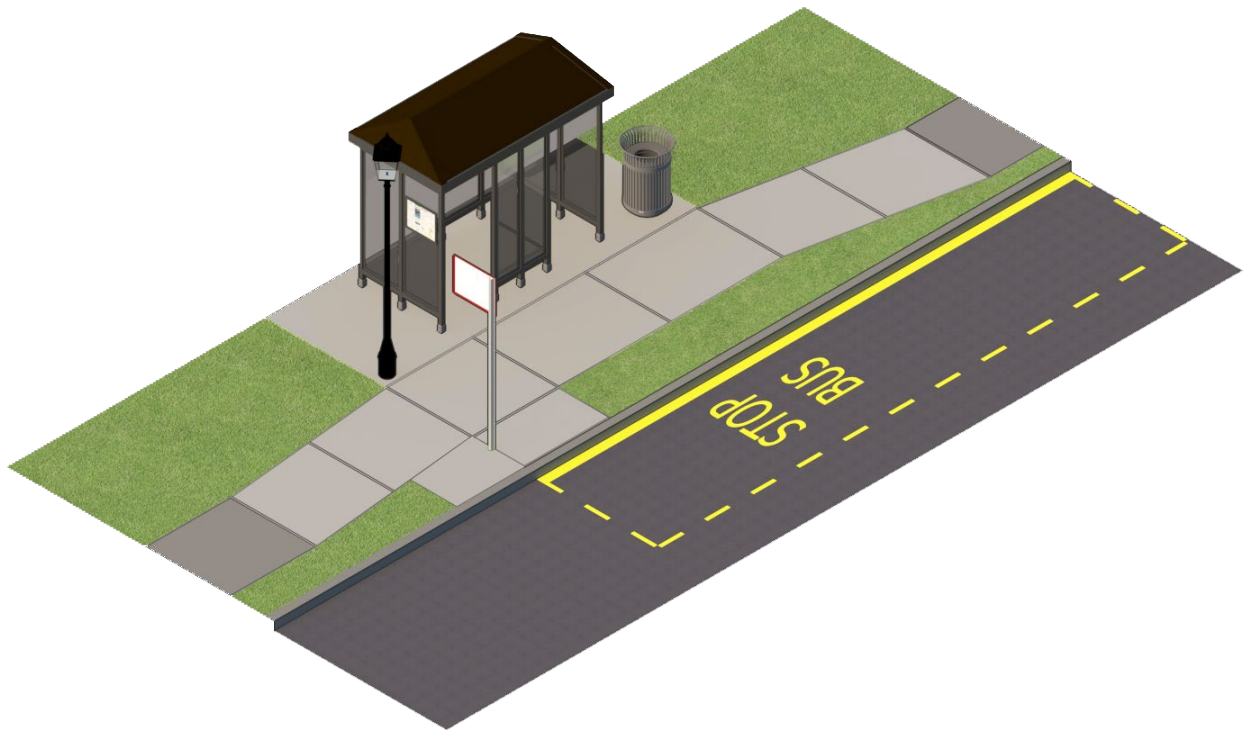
Main Street at Fairfax Building (Stop #87) – Tier 4
